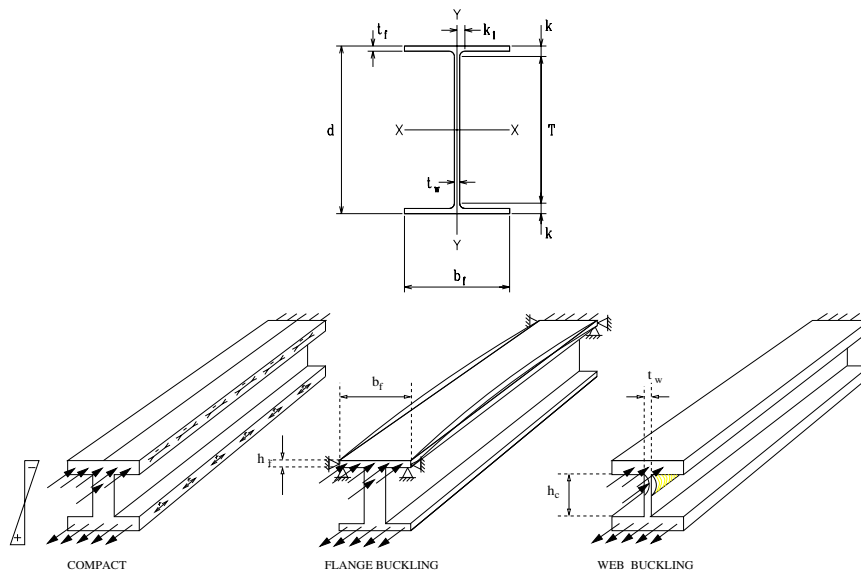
Failure of Steel beam; Local Buckling
